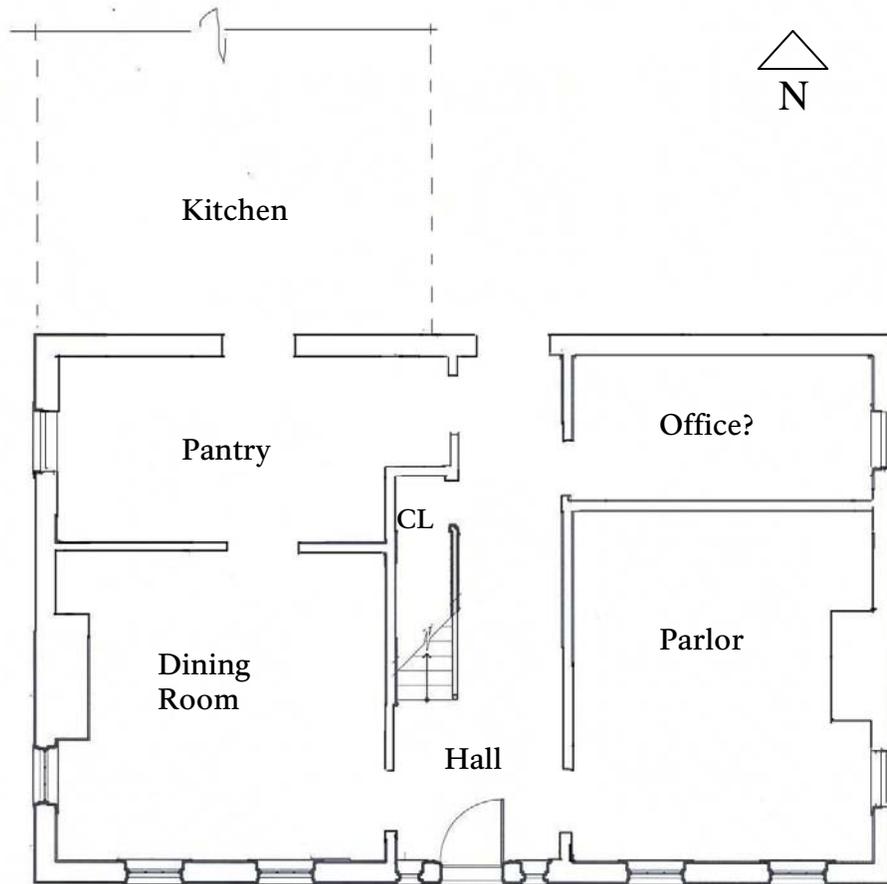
Conjectural first-floor plan of the Hunt House, circa 1828.
